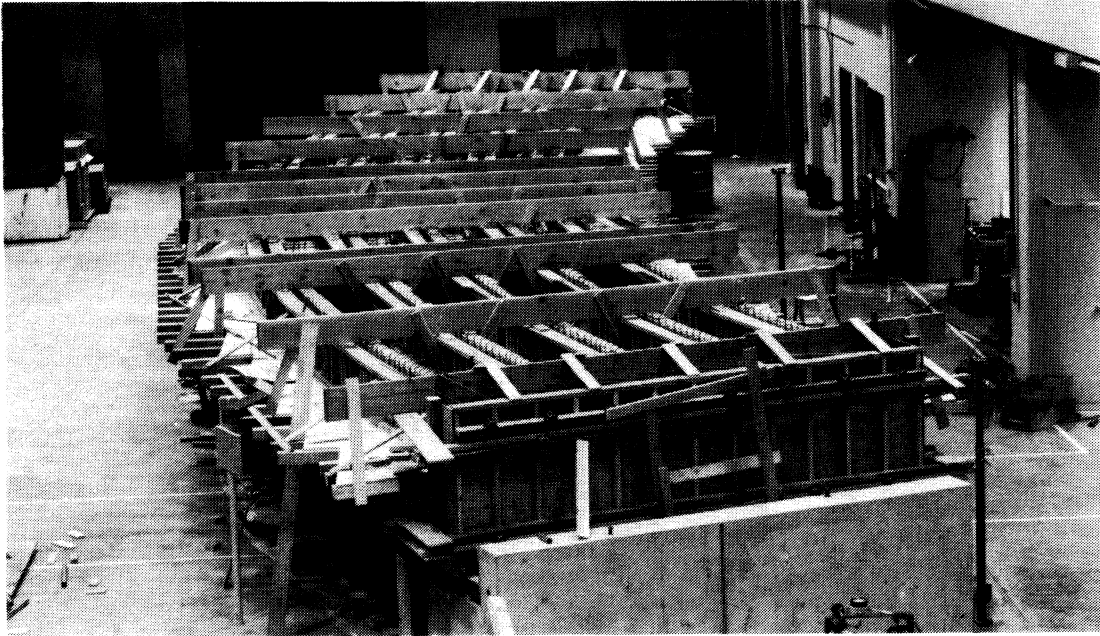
STEEL REINFORCEMENT FOR BOTTOM SLAB AND GIRDER WEBS AND DIAPHRAGMS
